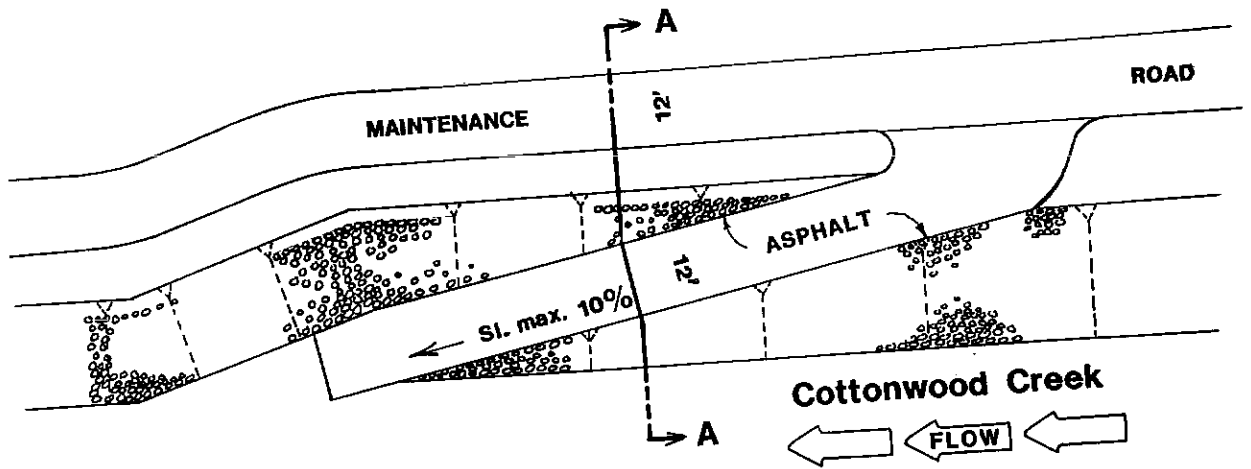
TYPICAL RIP-RAP SECTION
